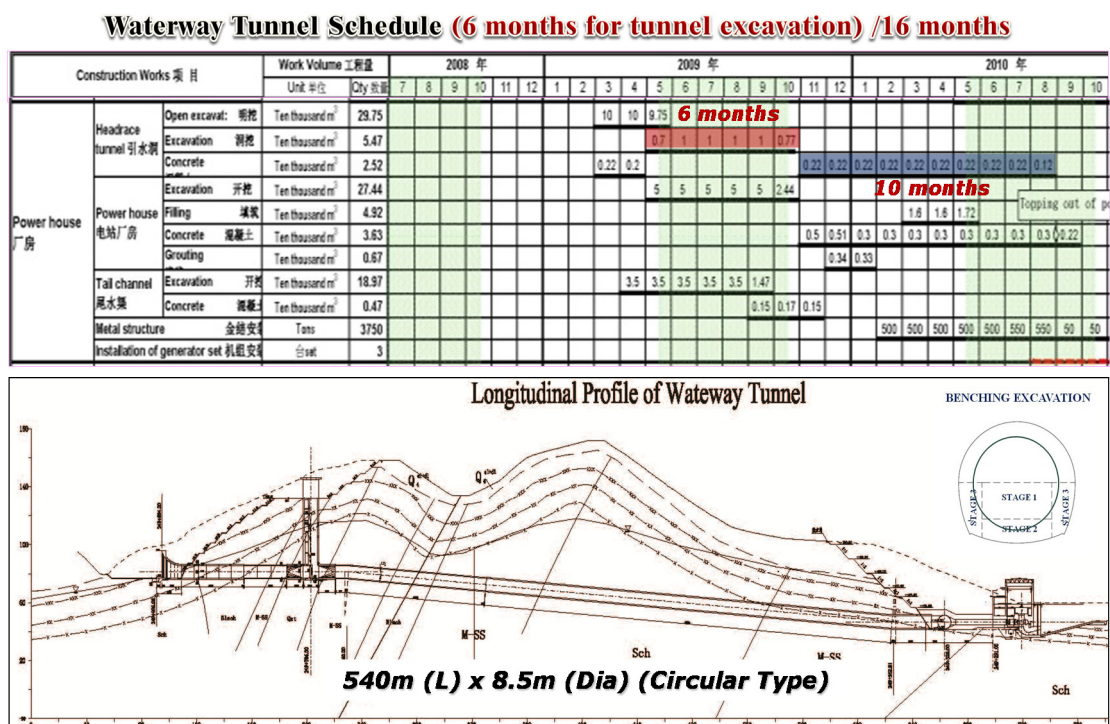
Waterway Tunnel Construction Schedule of Thaukyegat Project
